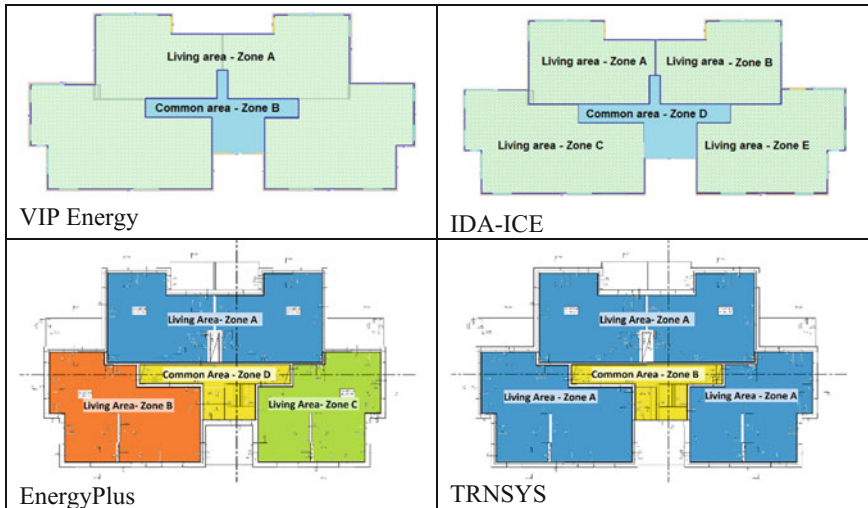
Configuration of thermal zones at a typical floor level in the models
